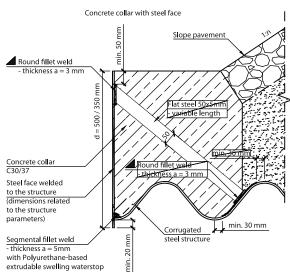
Example of a concrete collar on inlet and outlet of the structure
